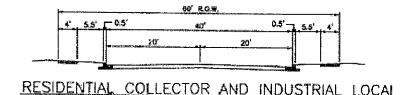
TYPICAL STREET CROSS-SECTIONS
